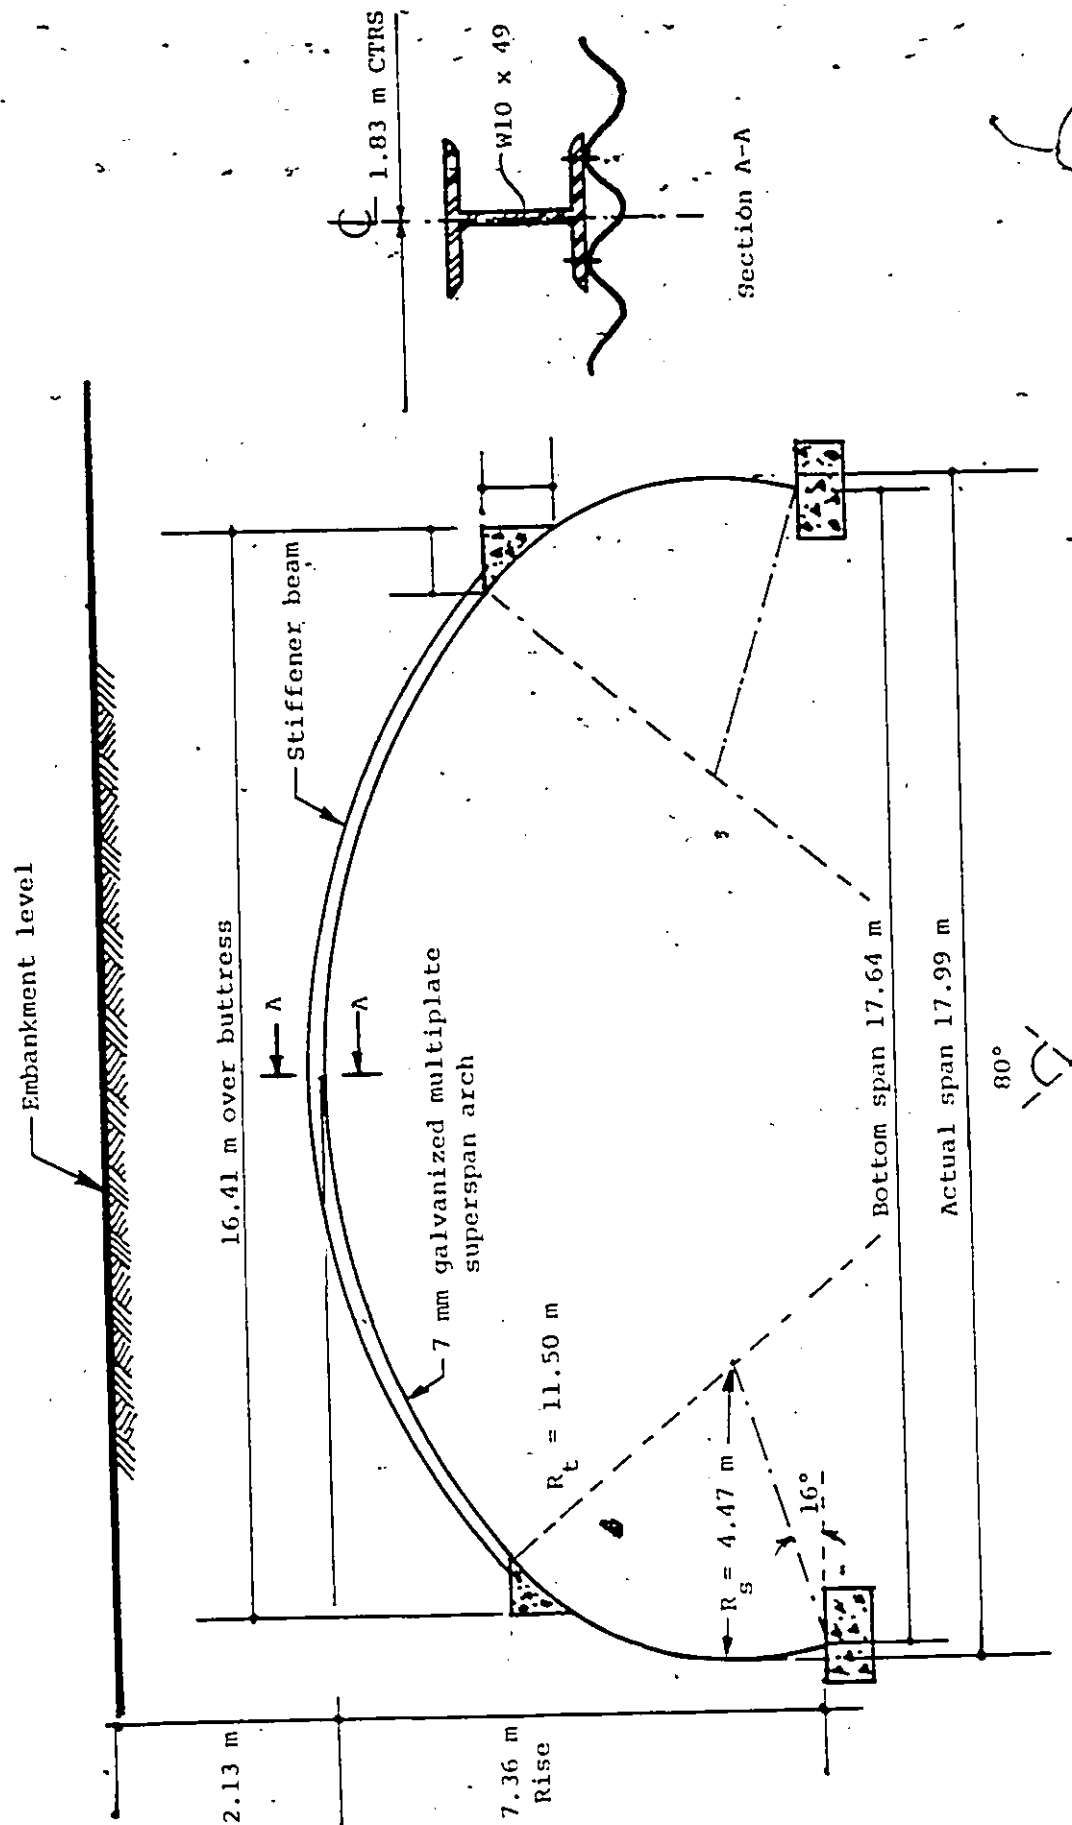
Cross-Sectional Details of Cheese Factory Bridge Structure
